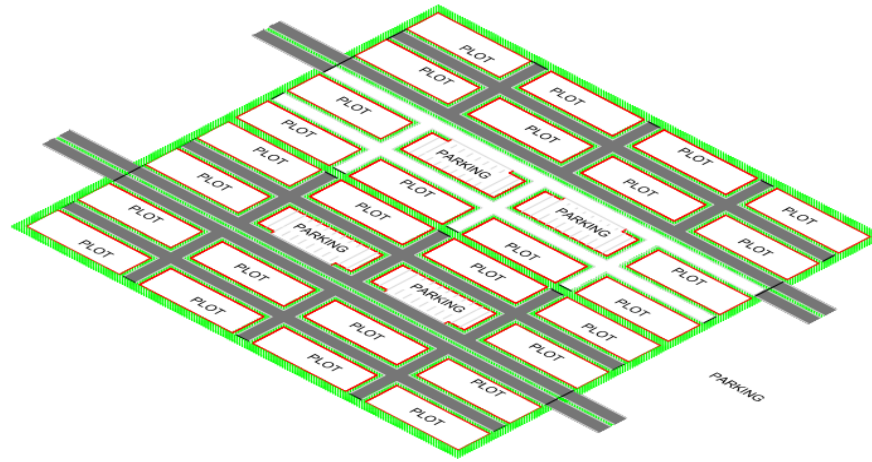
( C): The site layout plan at Ghanga Patna, in Bhubaneswar (Resettlement colony)
